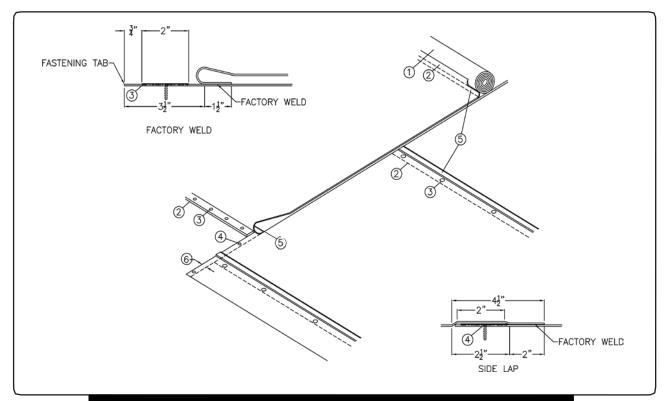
MEMBRANE ROOF ROLL-OUT AND FASTENER PLACEMENT DRAWING
